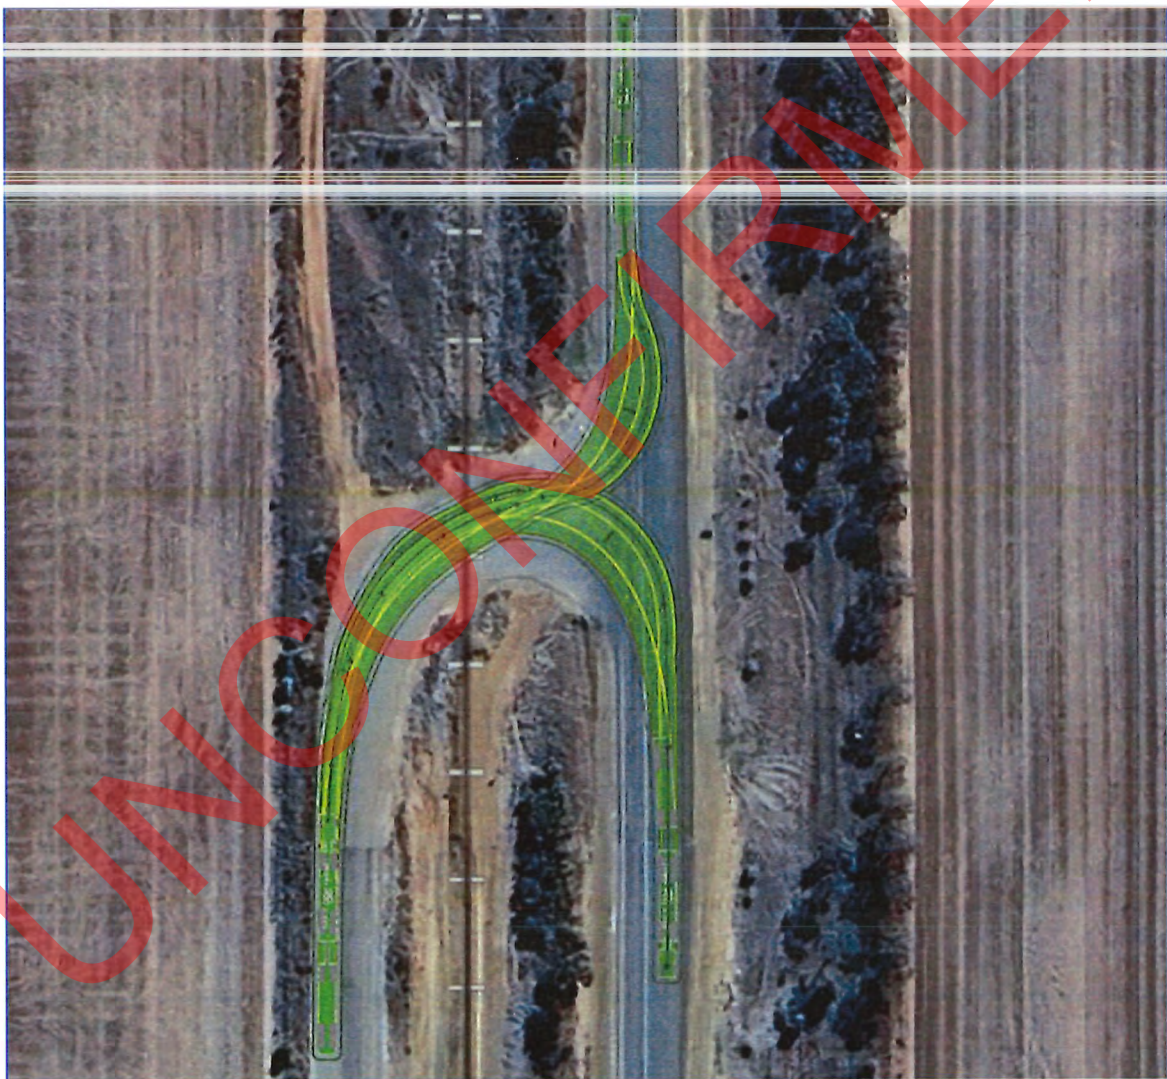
CBH Access Road/GNH Intersection-RT out and LT out RAV 7 Movements
